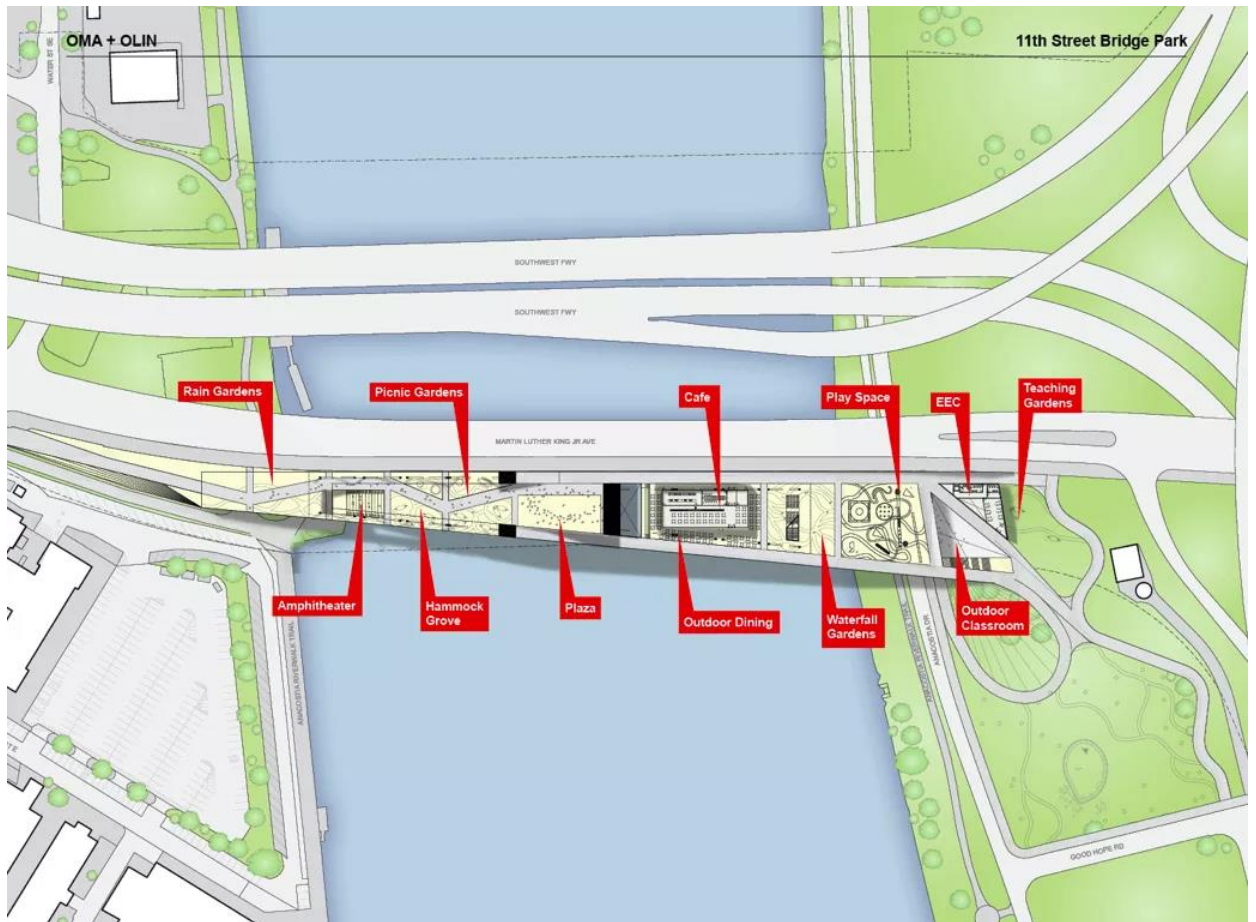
Plans for the 11th Street Bridge Park include features such as rain gardens, an amphitheater, a plaza, an outdoor classroom, and teaching gardens (OMA + OLIN)
